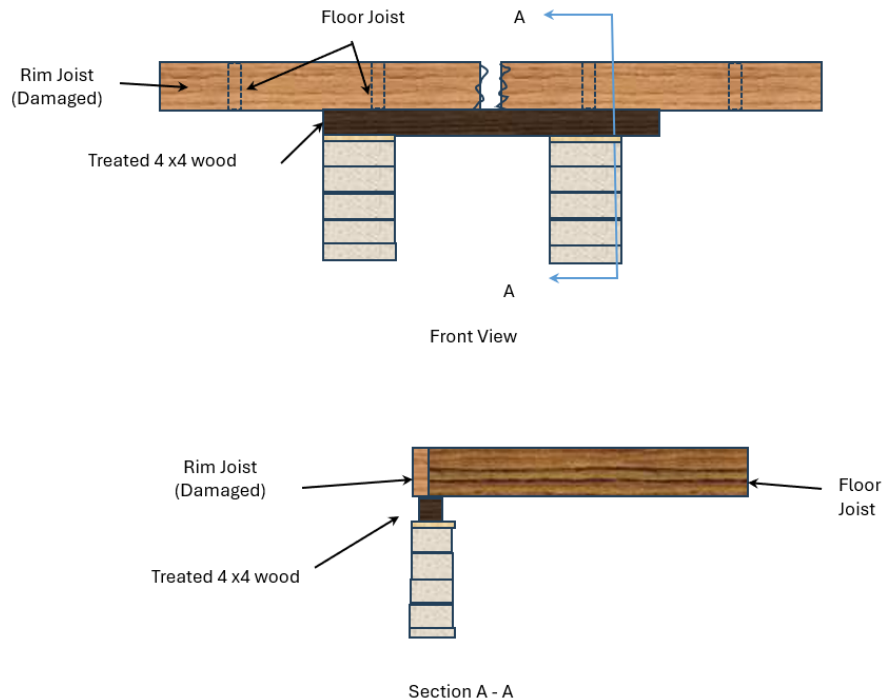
Bracing for Perimeter Piers Under a Damaged Rim Joist
